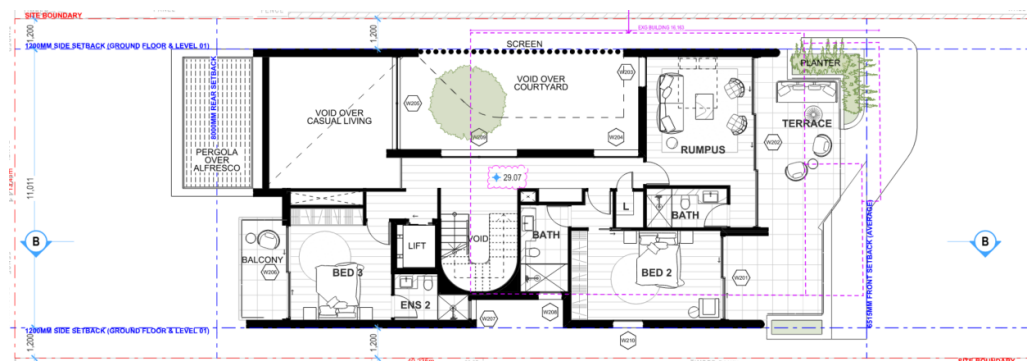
Proposed first floor plan - 61 The Corso, Maroubra (Source: PopovBass)
